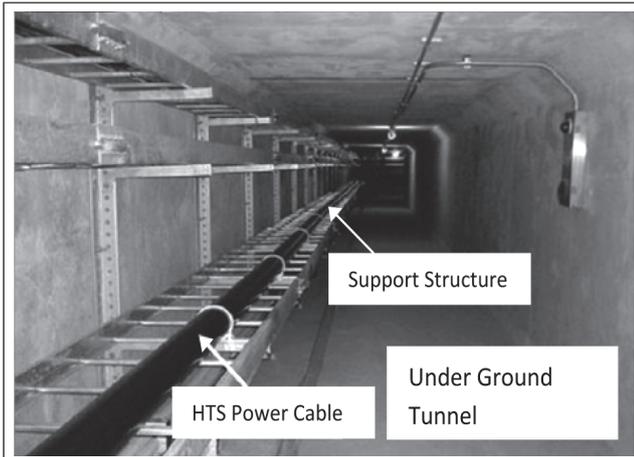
CABLE INSTALLATION IN A TUNNEL
